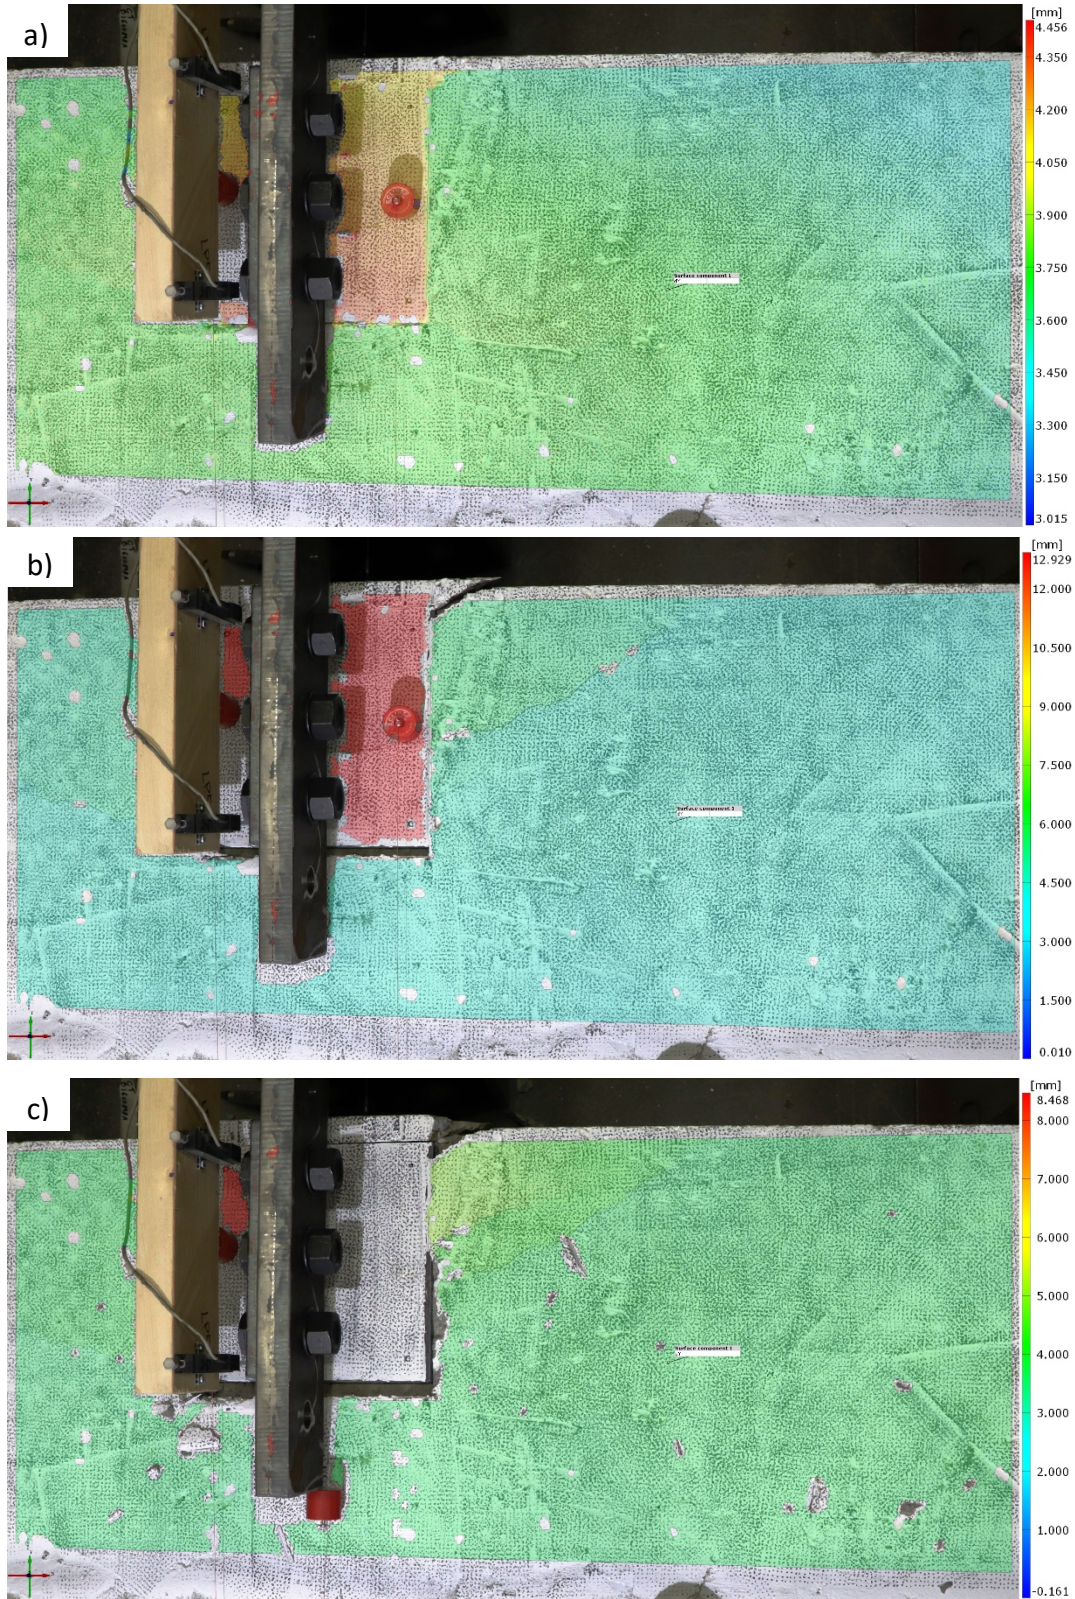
DIC images of SEP4-150-75 at (a) initial cracking, (b) peak load, (c) after sudden failure (right of connection)
